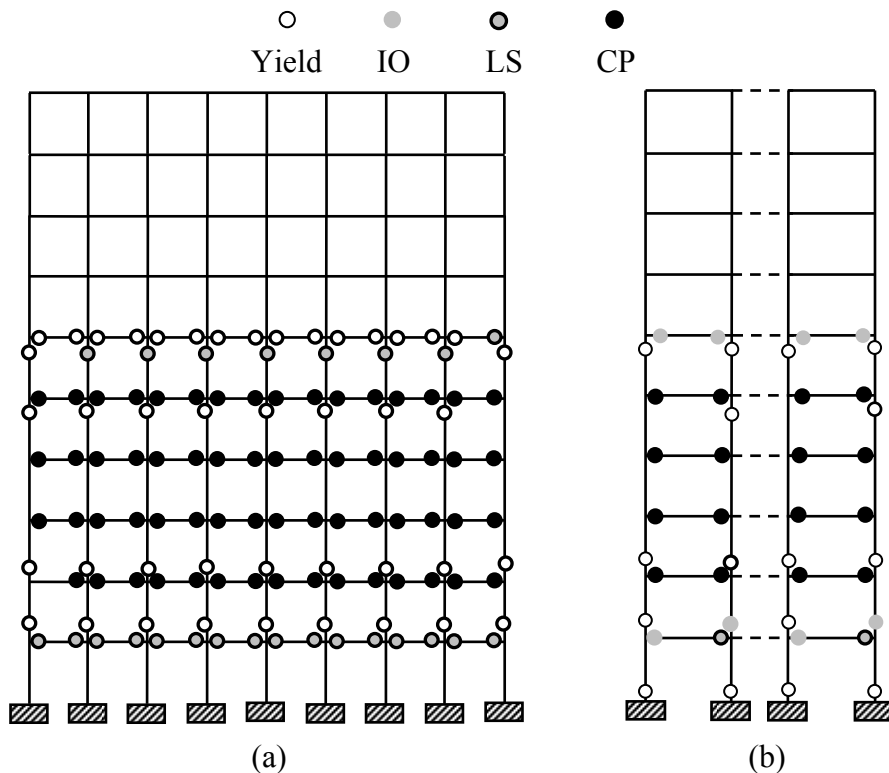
Collapse mechanism of ten storey RC frame building with URM infills, designed as SMRF as per relevant Indian Standards: (a) typical longitudinal frame; (b) typical transverse frame.
